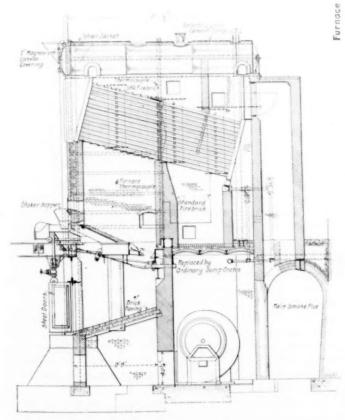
Sectional View of Boiler Unit of the Cleveland Railway Company
